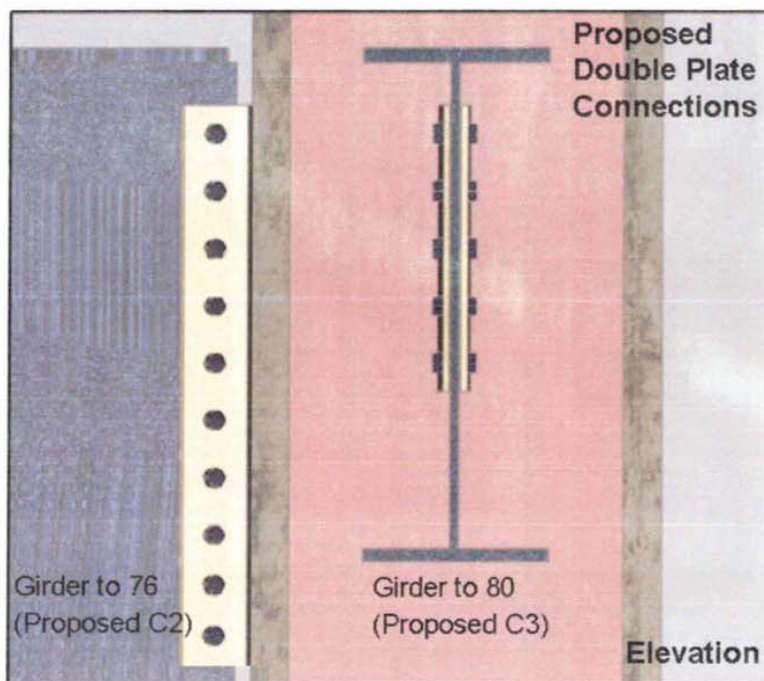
Cross-sectional View of Proposed Connections at Column 79
